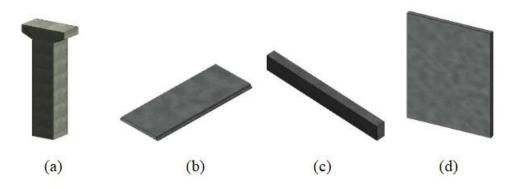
(a) Square column, (b) Slab, (c) Rectangular beam, (d) Wall.
